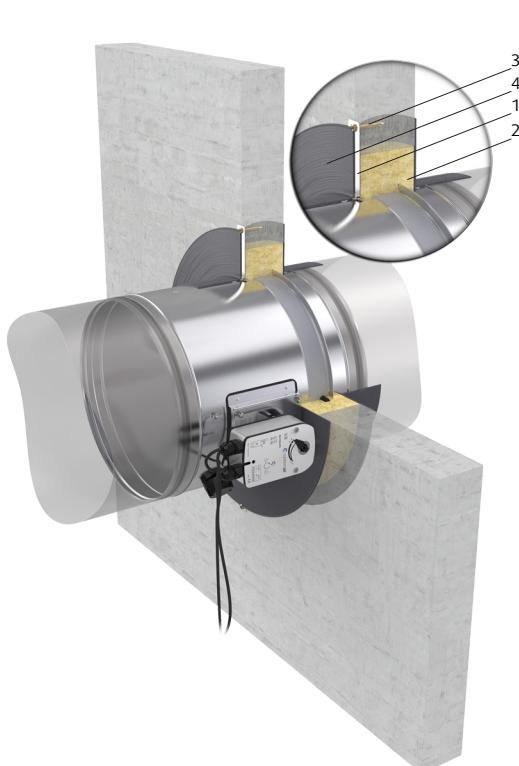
Installation of a round fire damper PKIR into a soft crossing
